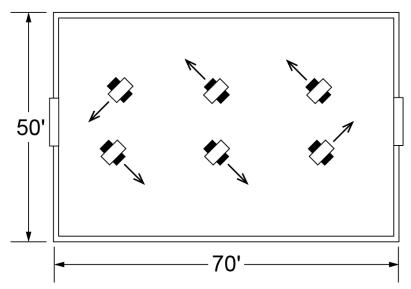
Horizontal unit heaters arranged for four high heat loss walls. (Skilled Trades BC, 2021) Used with permission.
